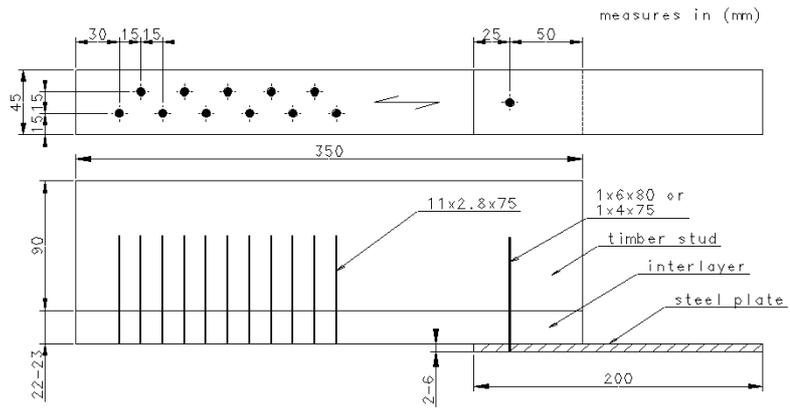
Test set-up of the single shear timber-interlayer-steel plate joints
